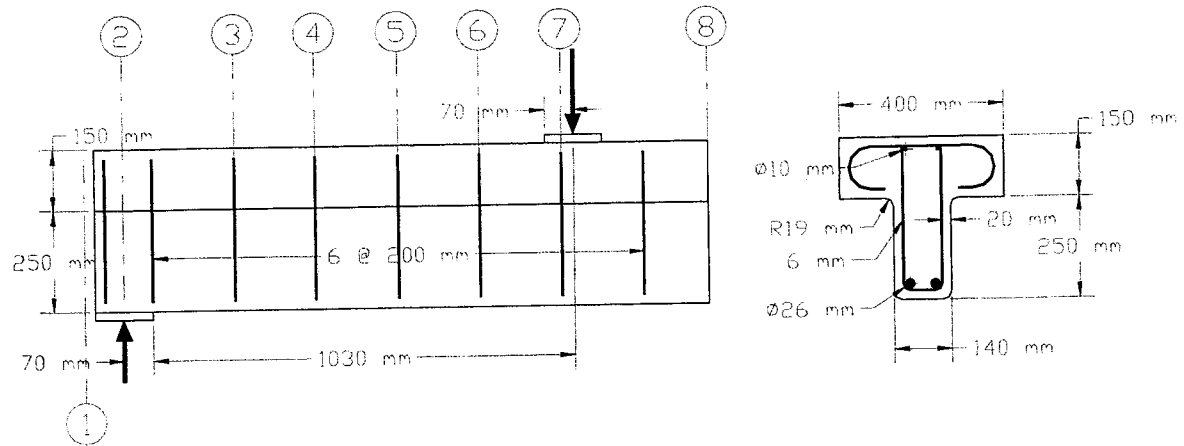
T-beam Cross Section and Stirrup Layout with 200 mm Spacing
